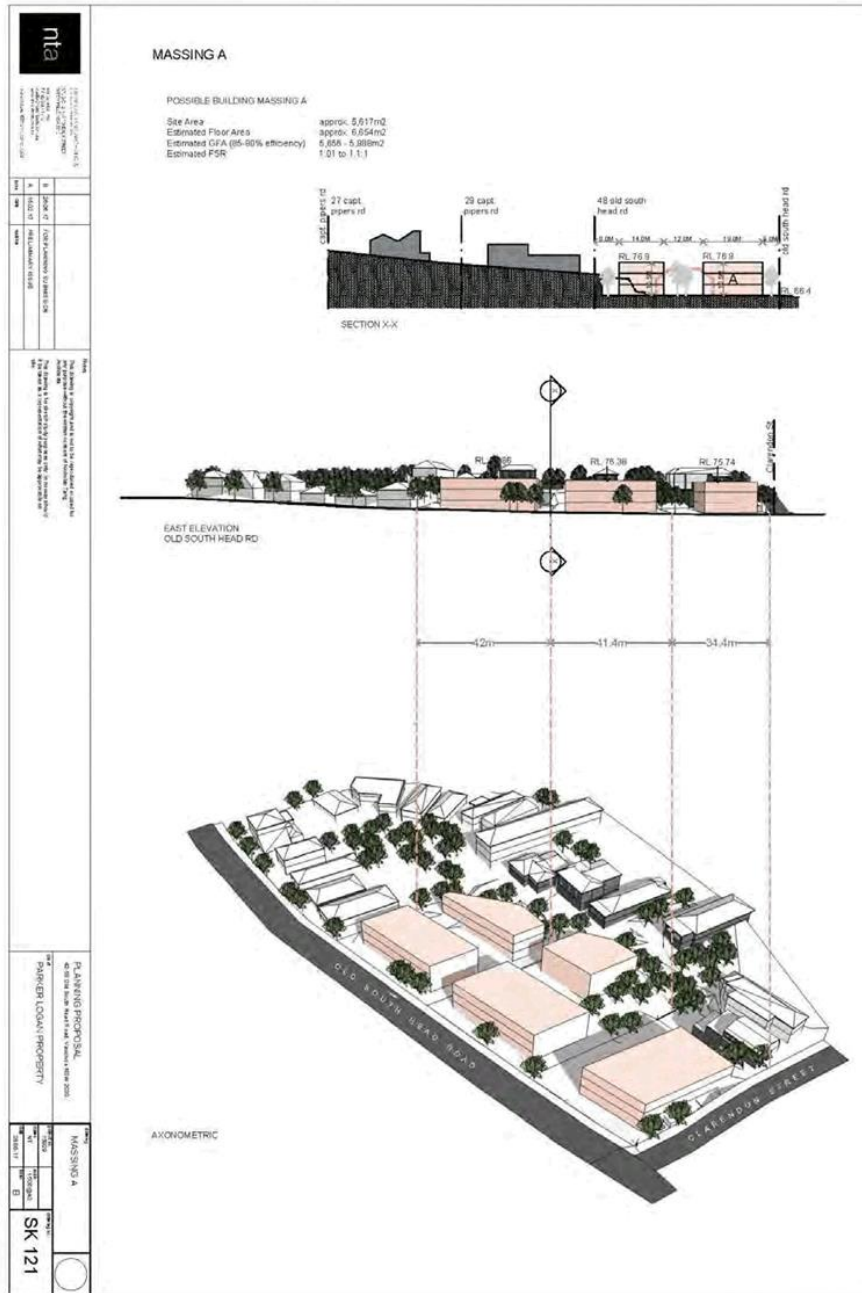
Building massing concept A (source: Nicholas Tang Architects)
